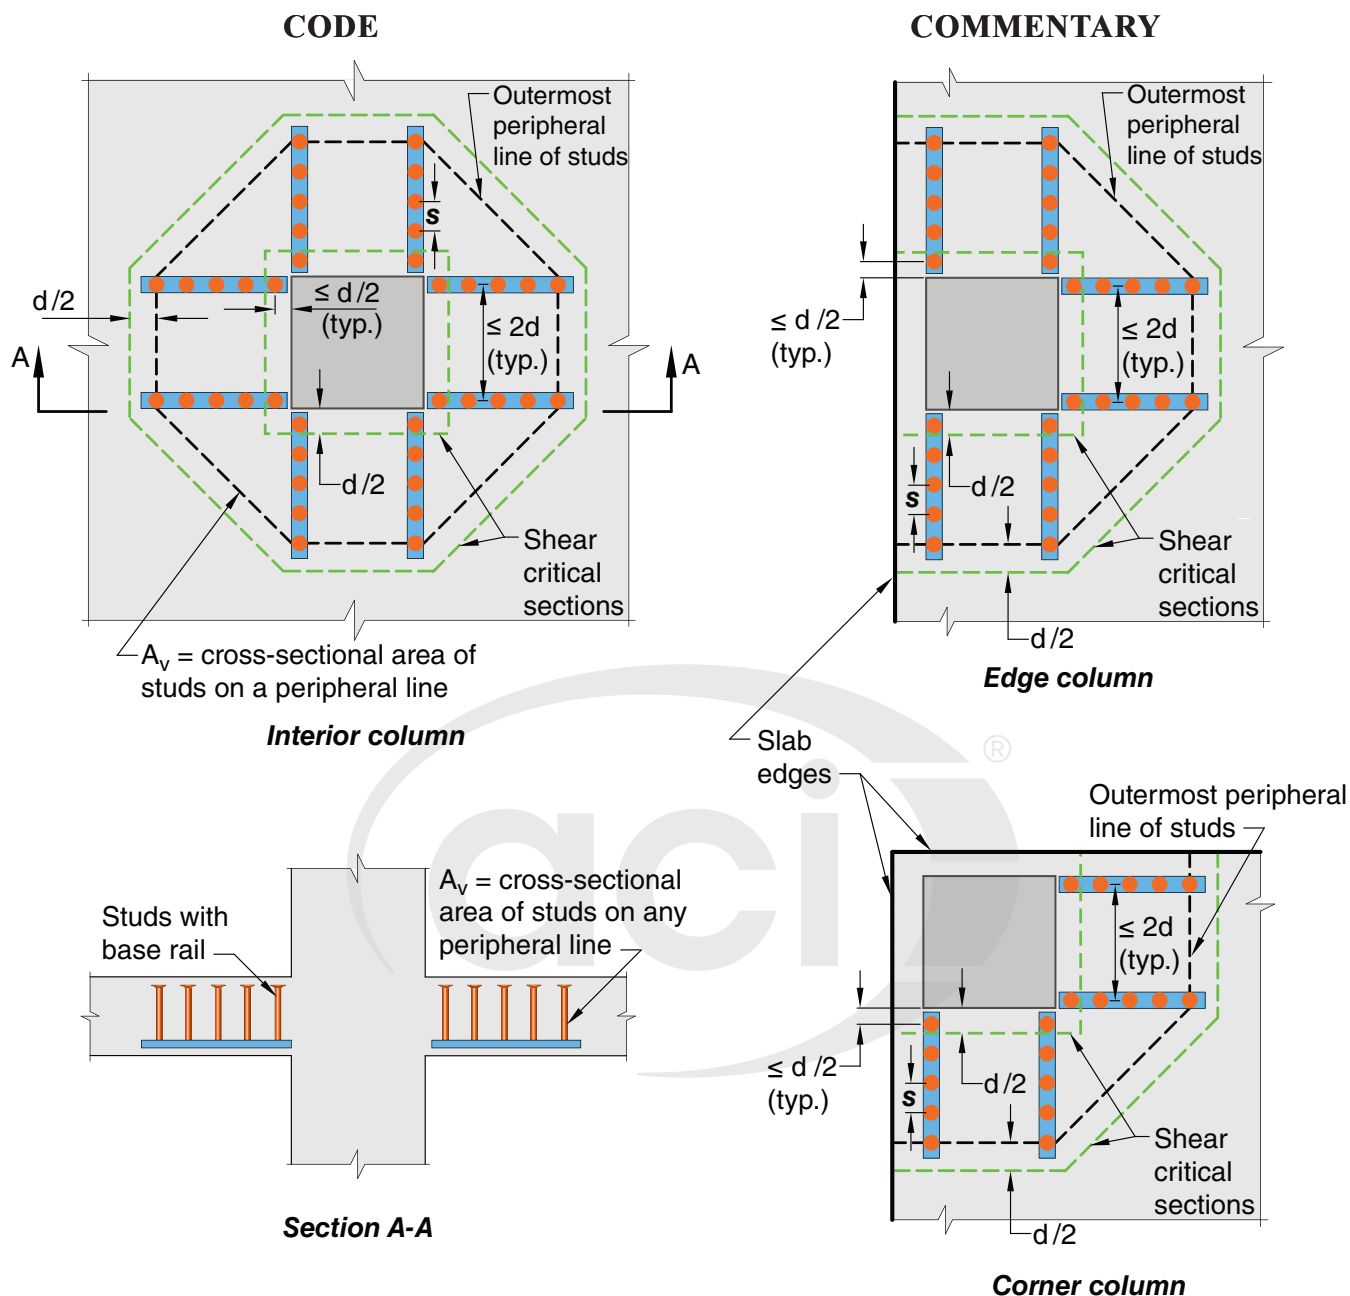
Typical arrangements of headed shear stud reinforcement and critical sections.
